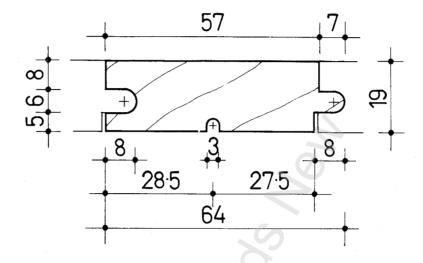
75 mm x 25 mm TONGUE AND GROOVE FLOORING (full size)
